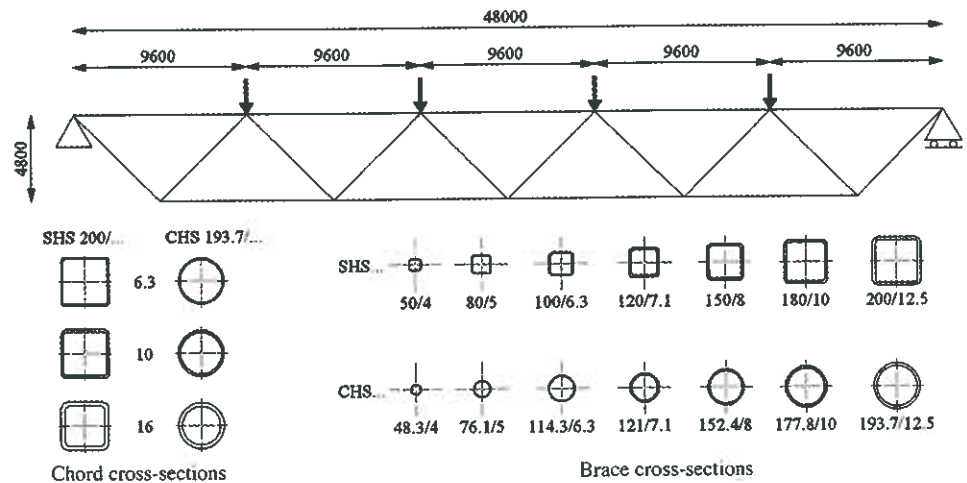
Basic geometry of lattice girder used in parameter study and cross-sections used
